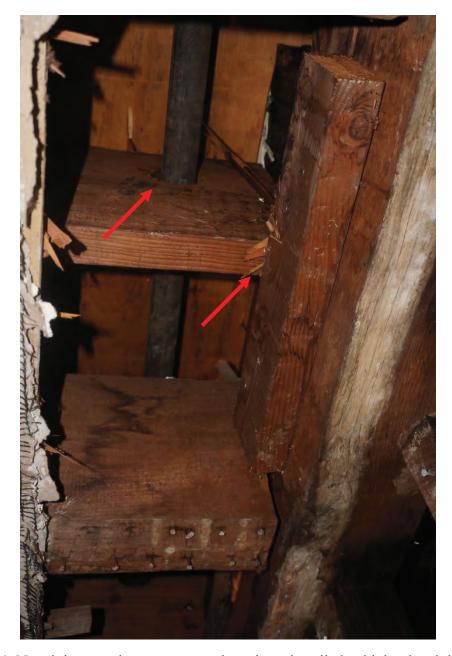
New joists running east to west have been installed at higher level than original joists and are resting on a 2x4 wood ledges that have been nailed to girder to support attic floor above. It is unclear why these joists were installed. Further investigation required to figure out why this was done. Original joists left in place and still supporting ceiling below. Multiple joists supporting attic floor above have holes drilled above their neutral axis at the joists ends where shear force is the highest (Probe #8).
